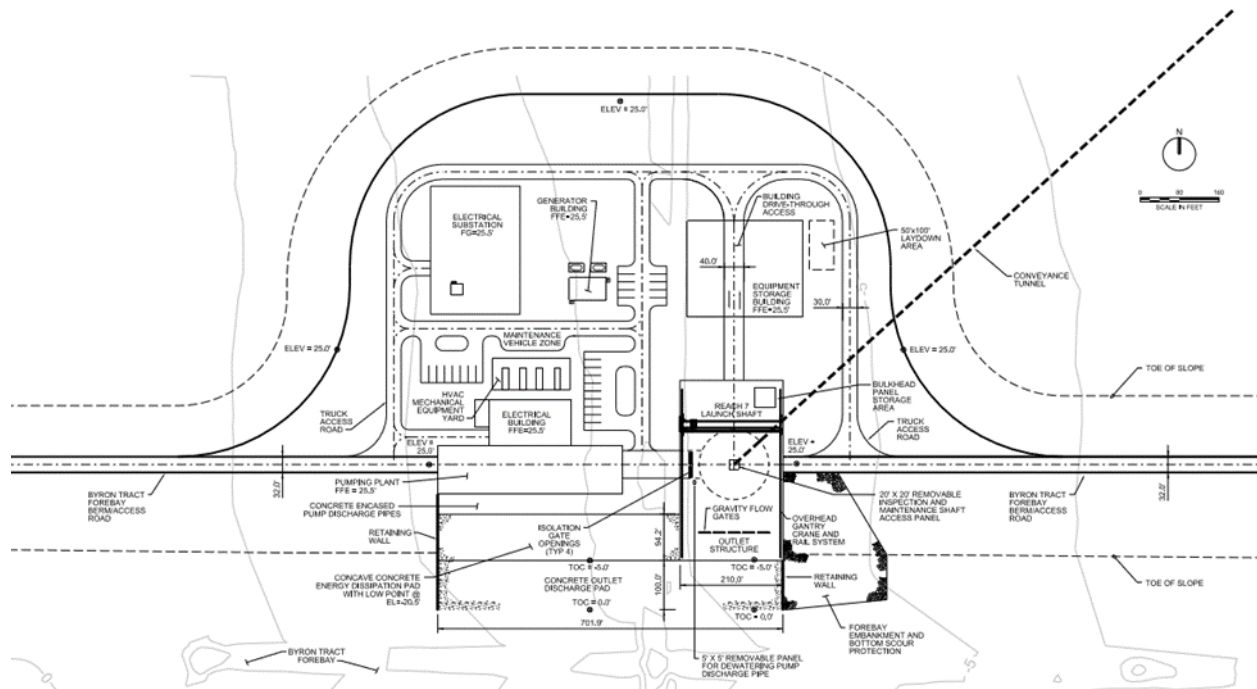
SDPP Facilities Conceptual Configuration and Site Plan
